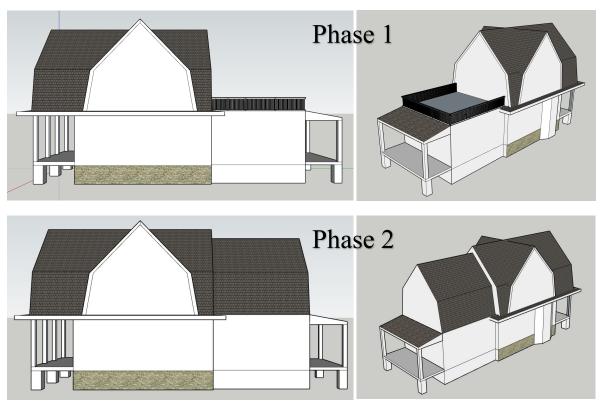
Staff Option #1, massing model of a hypothetical flat roof addition with balustrade. The top images shows the first phase while the bottom images depicts a potential future second story addition.
